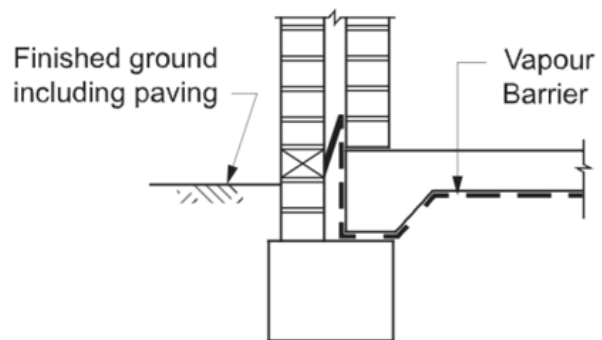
Acceptable vapour barrier and damp-proofing membrane location
